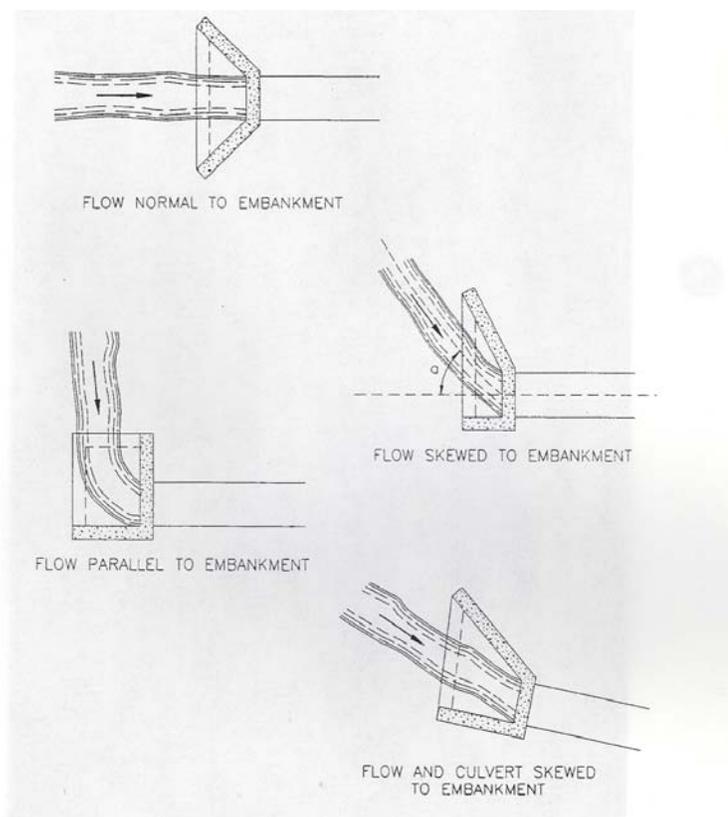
9: Typical Headwall/Wingwall Configurations for Skewed Channels
